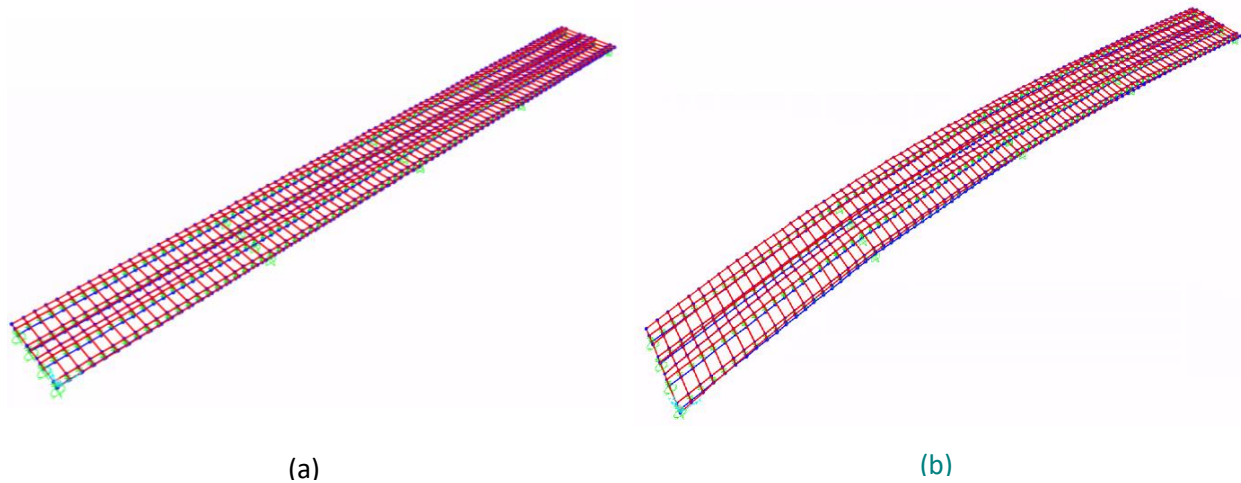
Finite Element Models: (a) Straight Bridge; and (b) Curved Bridge
